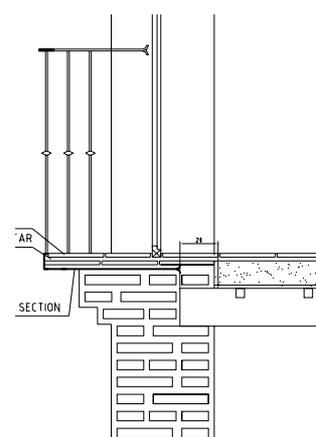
Constructive section of balcony from Feria st. 97 (Seville)
